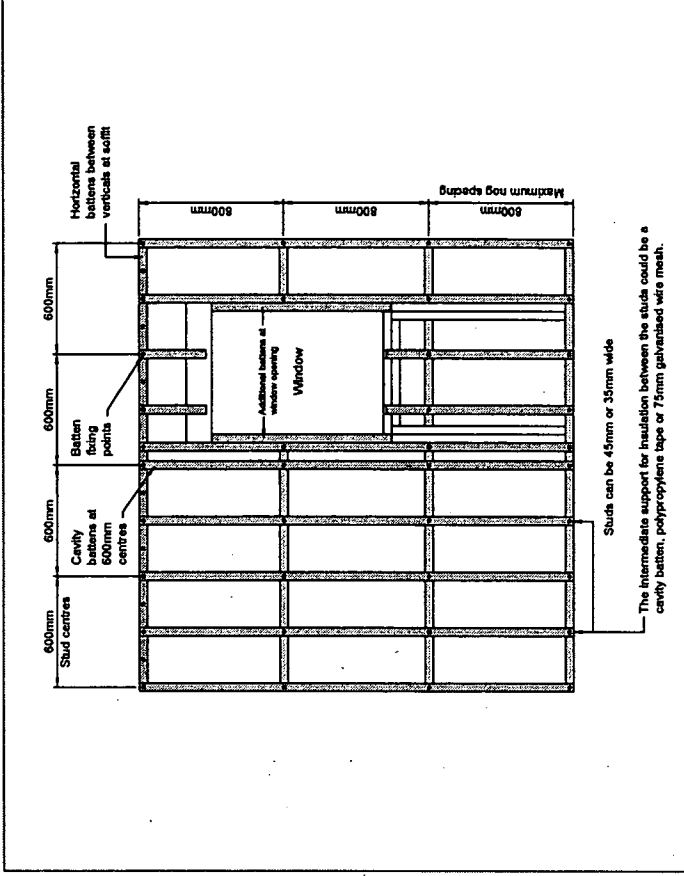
CAVITY BATTEN LAYOUT AT WINDOW OPENING
